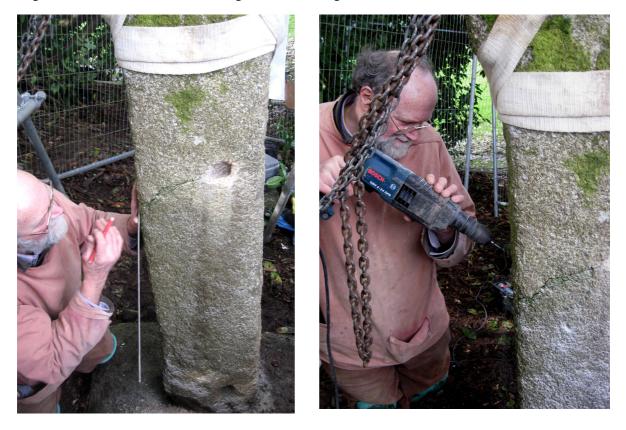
Measuring the cross for stainless steel dowels to tie the crack together; and drilling the shaft to take the dowels
